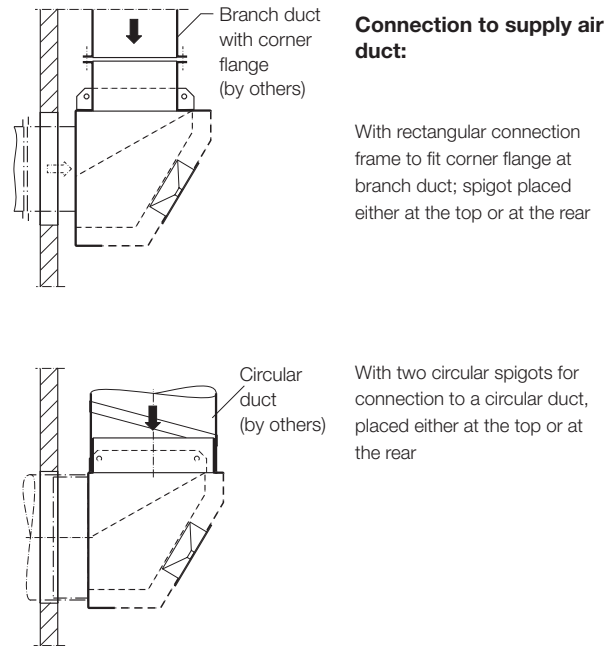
Semi-trapezoidal displacement outlet - Placement and connection types
